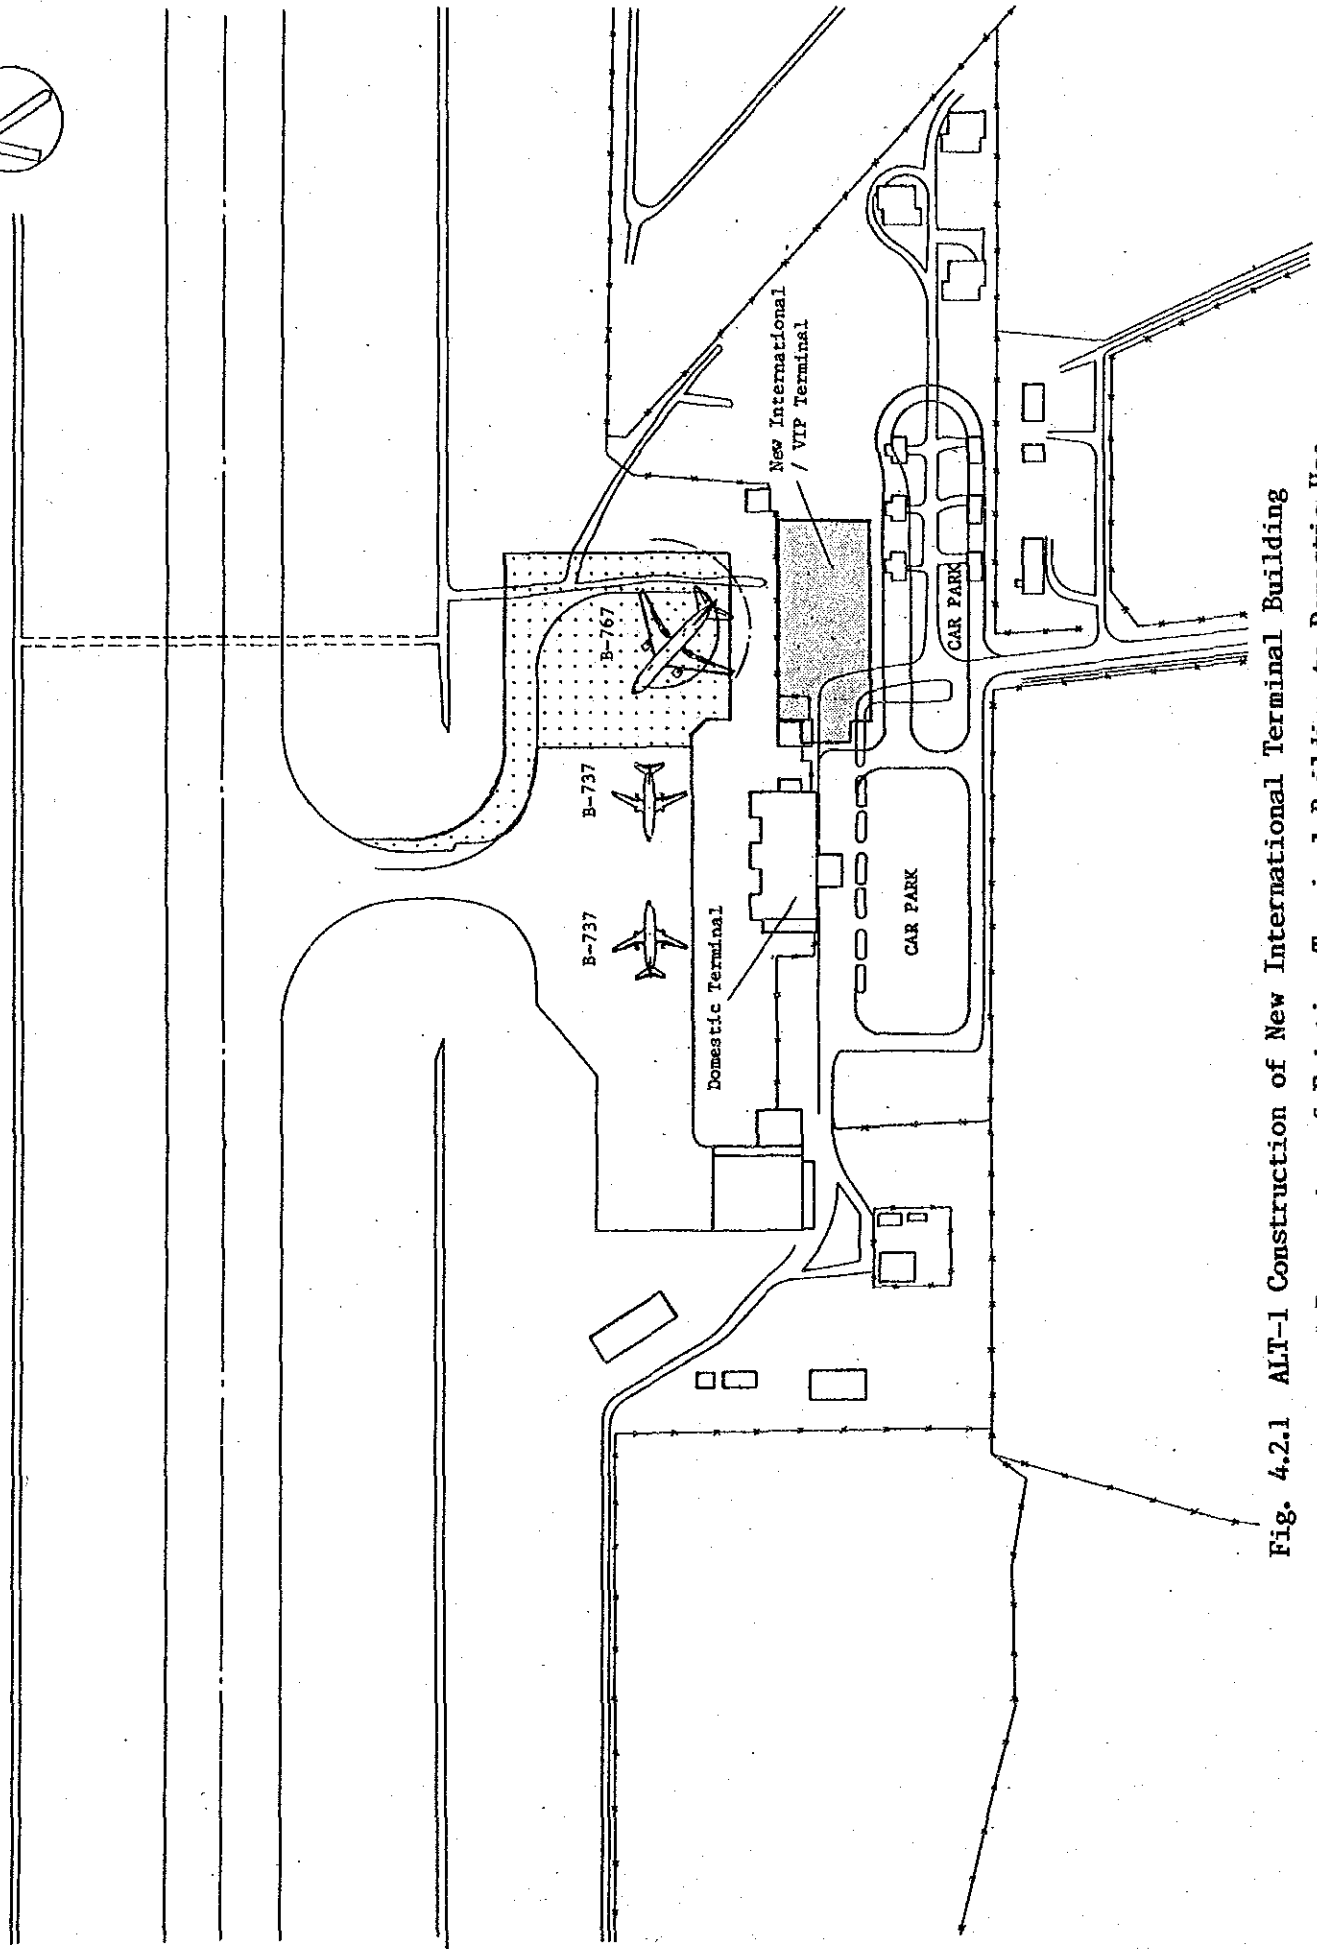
ALT-1 Construction of New International Terminal Building
